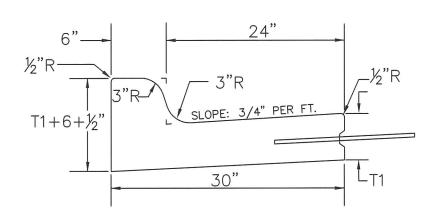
DETAIL FOR CONCRETE FLARES AND TAPERED CURB AT DRIVEWAYS
